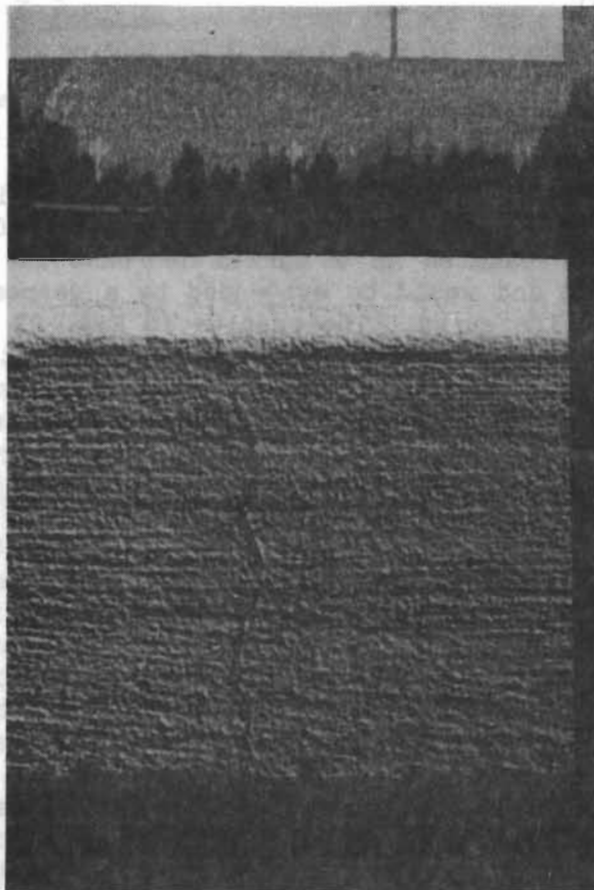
Apparent shrinkage cracks in concrete guard rail
